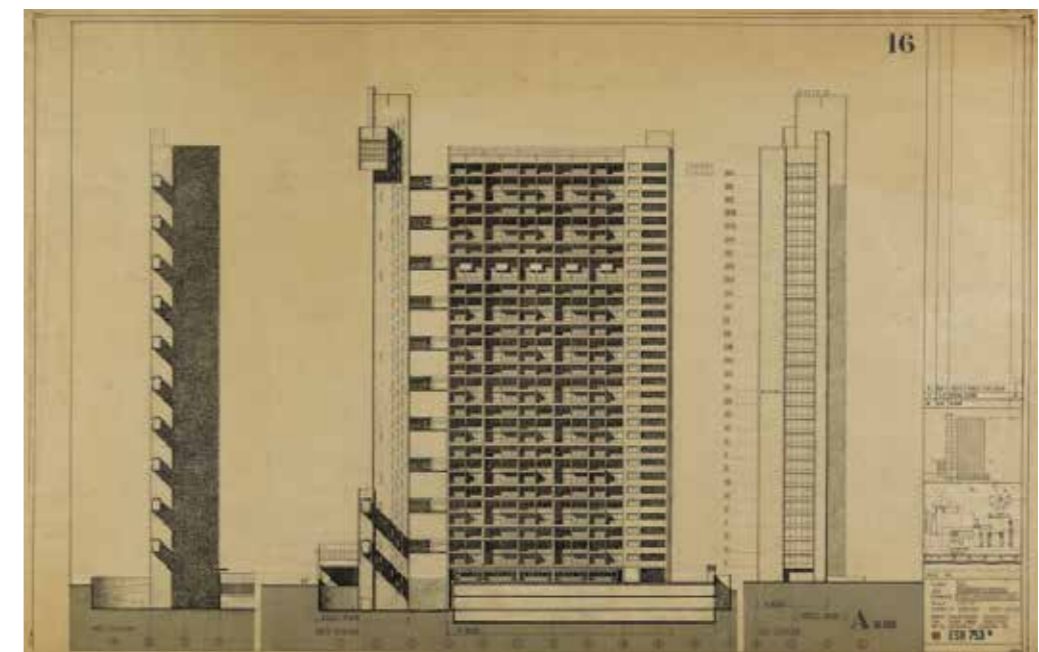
Designs for the Cheltenham Estate, Edenham Street, North Kensington, London: south, east and west elevations of block A (Trellick Tower) (phase I) Date: 1967. Source: Architectural Press Archive / RIBA Collections
